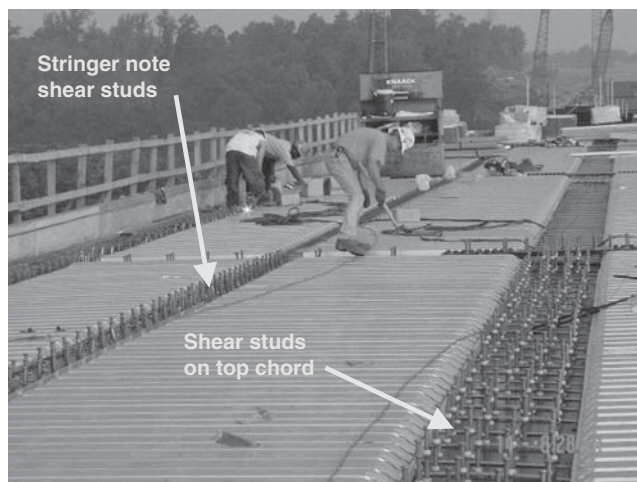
Shear studs being installed on top chords, floorbeams, and stringers on the SR-33 bridge near Easton, Pennsylvania.
